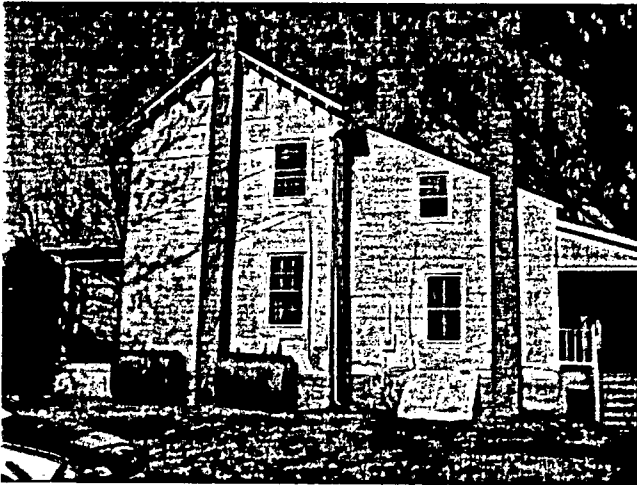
Current asbestos siding, as seen here on the South (side) wall of the Zeigler House, will be removed to reveal original horizontal wood siding (clapboard and novelty) that exists underneath.
